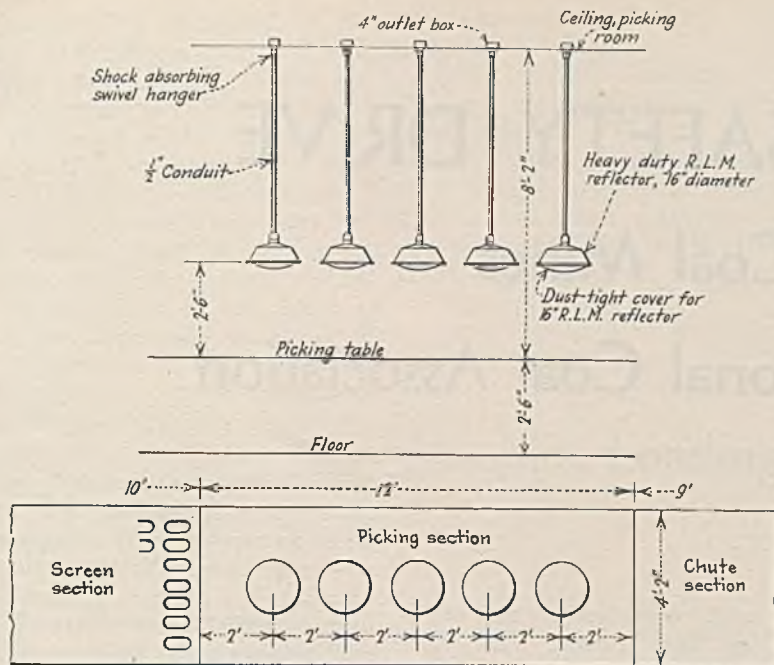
Detail Drawing of Lighting Installation as Designed for an Inspection Table 12 ft. Long by 4 Ft. 2 In. Wide
